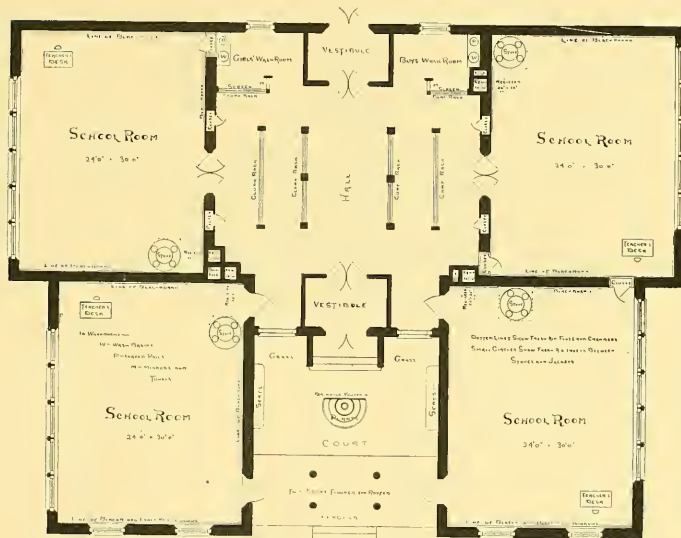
FLOOR PLAN OF SMALL SCHOOL BUILDING.
